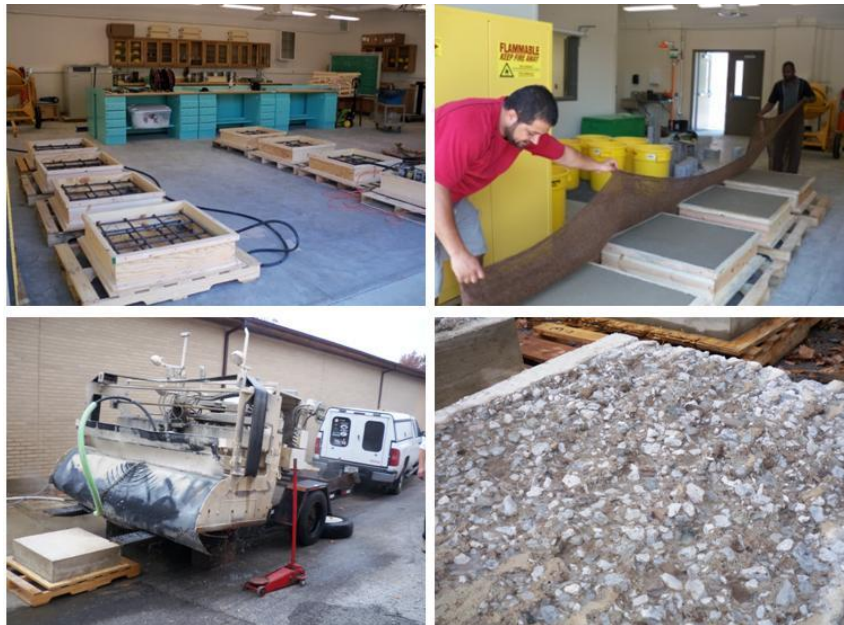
Casting and hydro-demolition surface preparation of the slab segments
